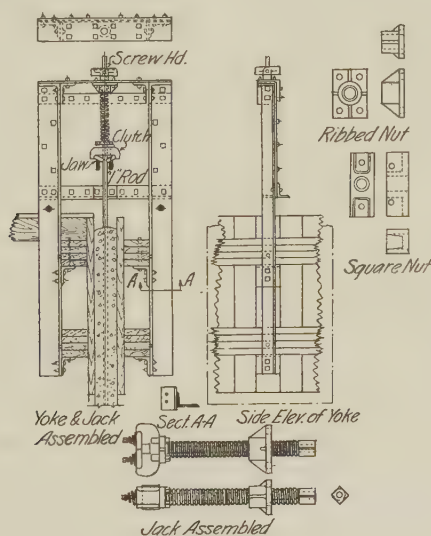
THE FOLWELL-SINKS JACK AND FORM
